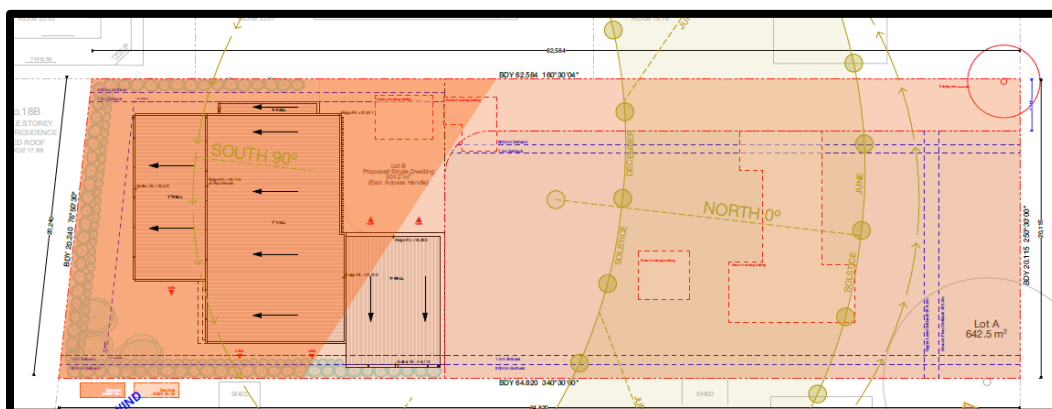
Site plan with ANEF overlay. Front allotment falls within the 20-25 contour with the rear allotment falling within the 25+ contour.
